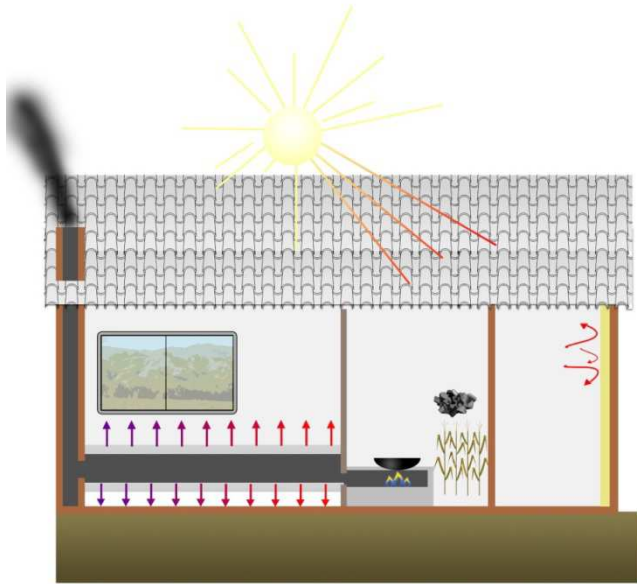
Traditional home with elevated Kang, improved windows and building insulation
